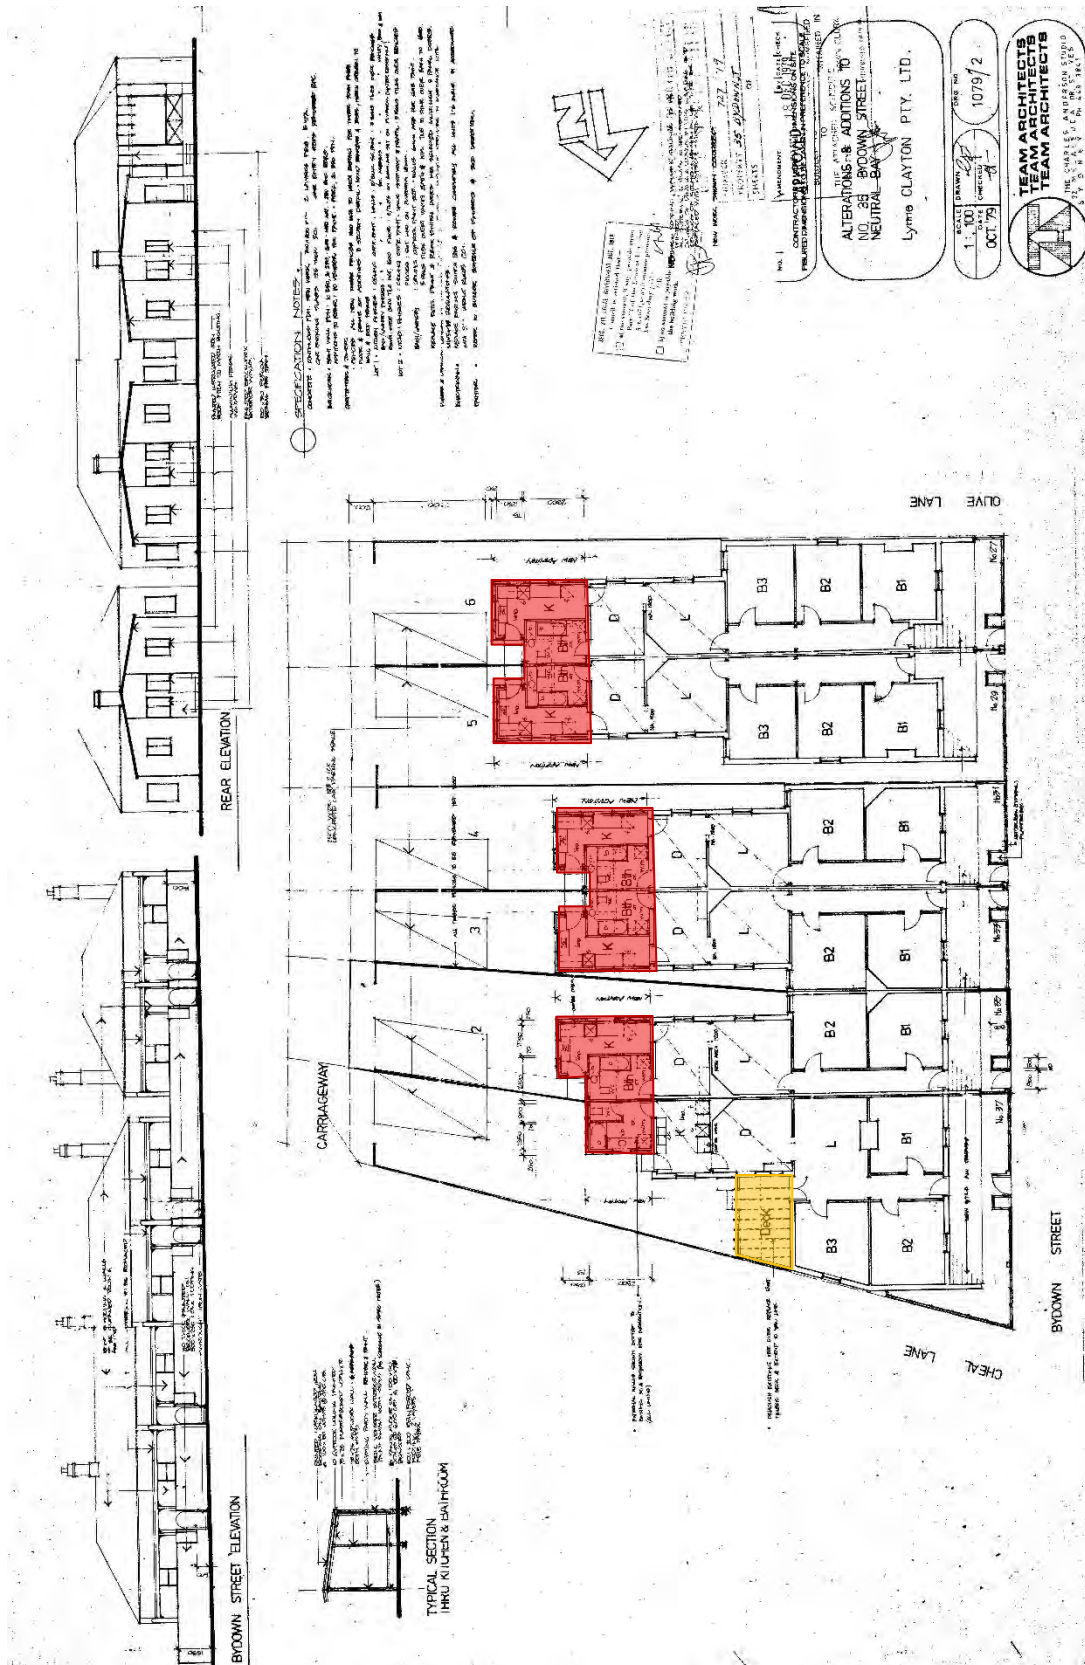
1979 drawings showing proposed renovations and the addition of a kitchen, bathroom/toilet and laundry for all properties (shaded in red), and deck for No.37 (shaded in yellow) (DA No. 1725/79 and BA No. 79/731). (Source: North Sydney Council Archives)
